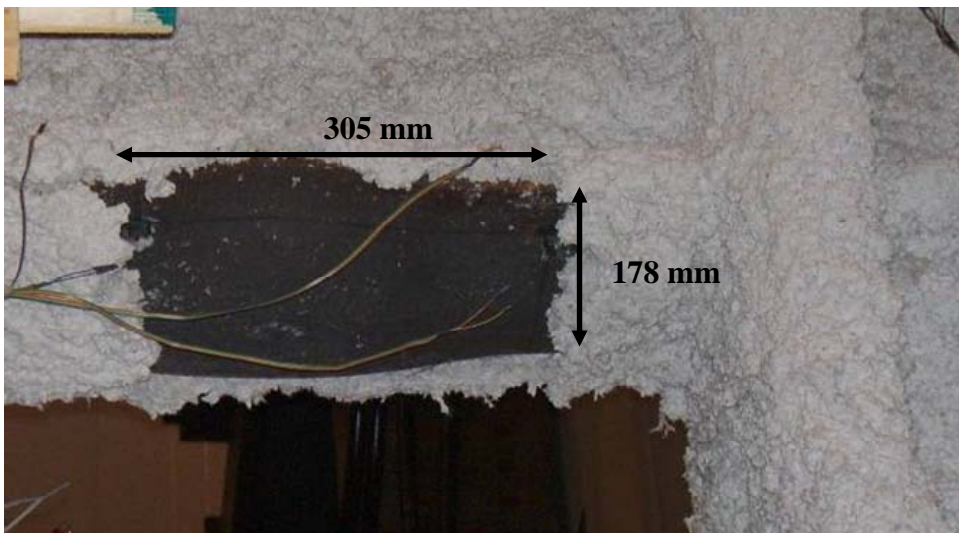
Details of first damaged portion of SFRM on bottom flange of DM assemblage during step 10
